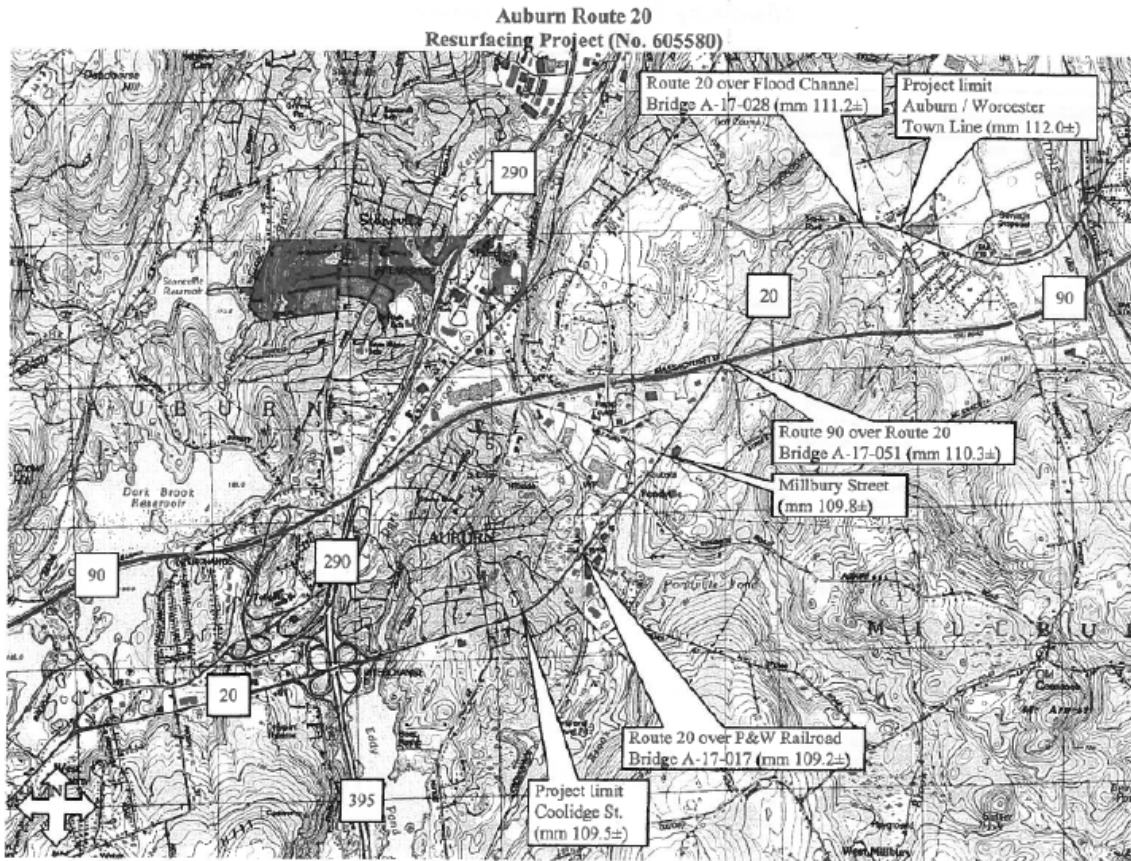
P6 site locus plan, Route 20 (Washington St.) Auburn
